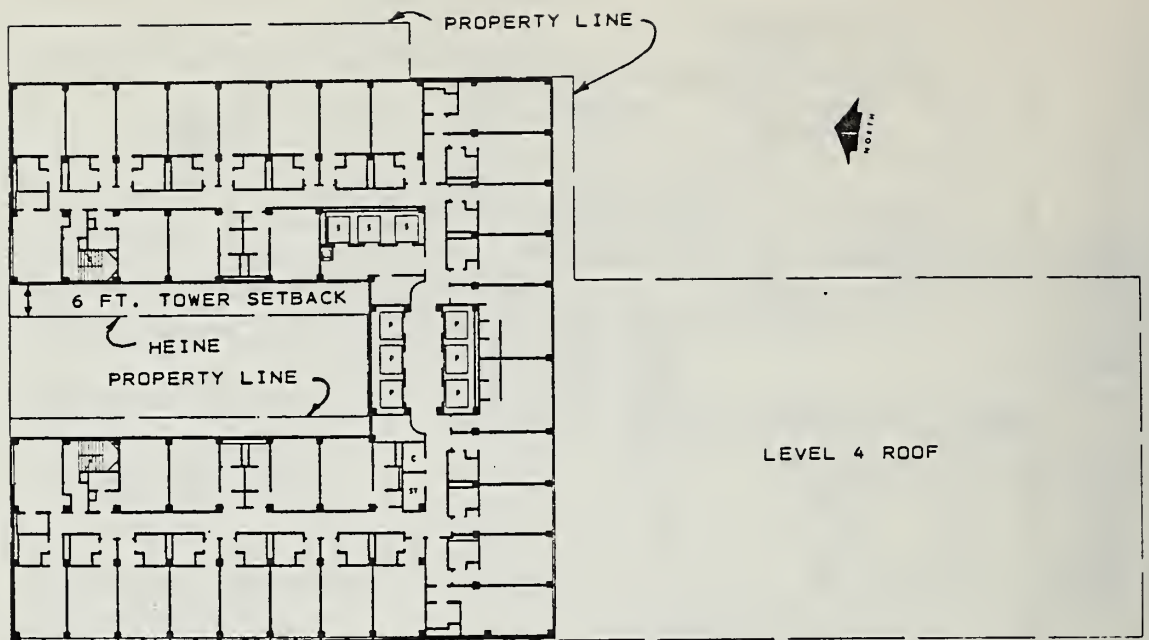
LEVEL 3 & 4 FLOOR PLANS
